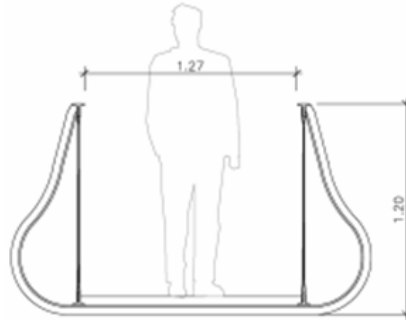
Existing section OBG12 Clonsilla station footbridge
